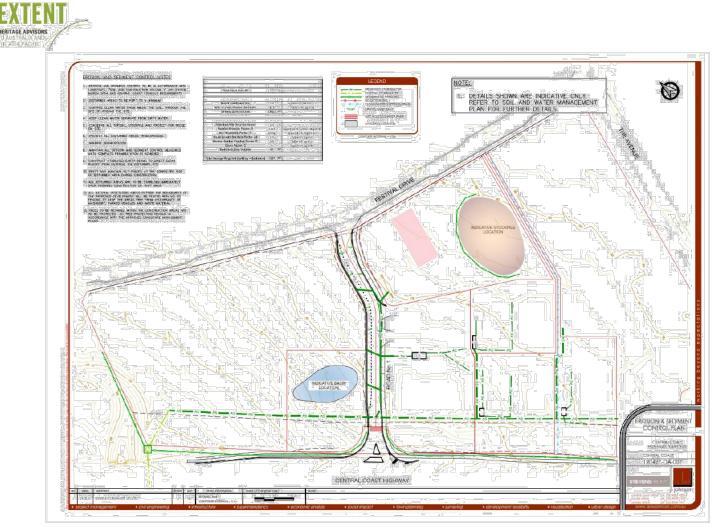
Erosion and Sediment Control Plan (source: ADW Johnson, Erosion and Sediment Control Plan, Drawing No.190427-DA-007).
